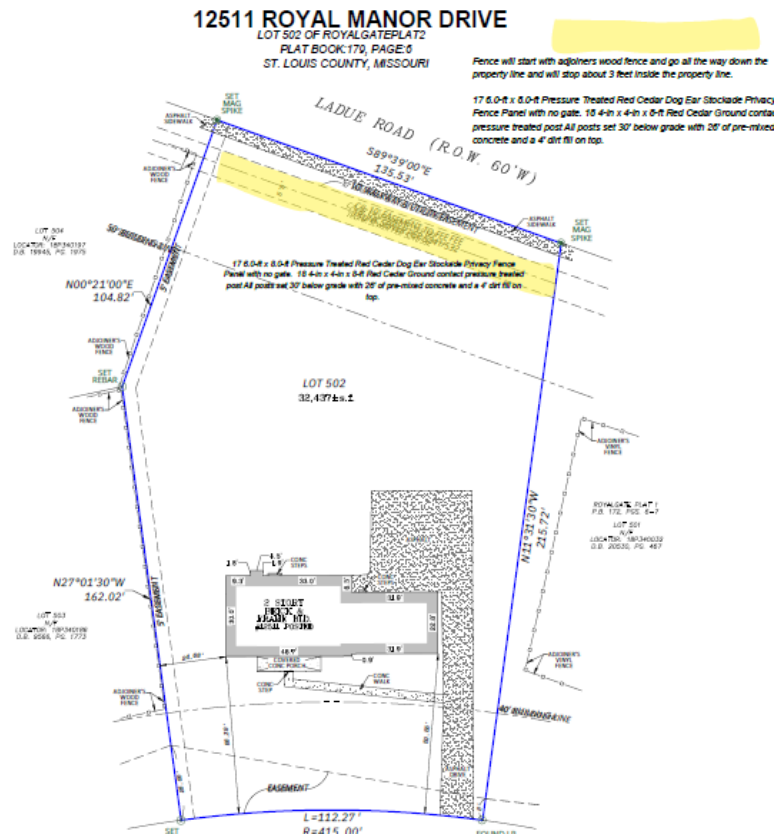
Applicant's Site Plan with proposed fence location shown in yellow.
